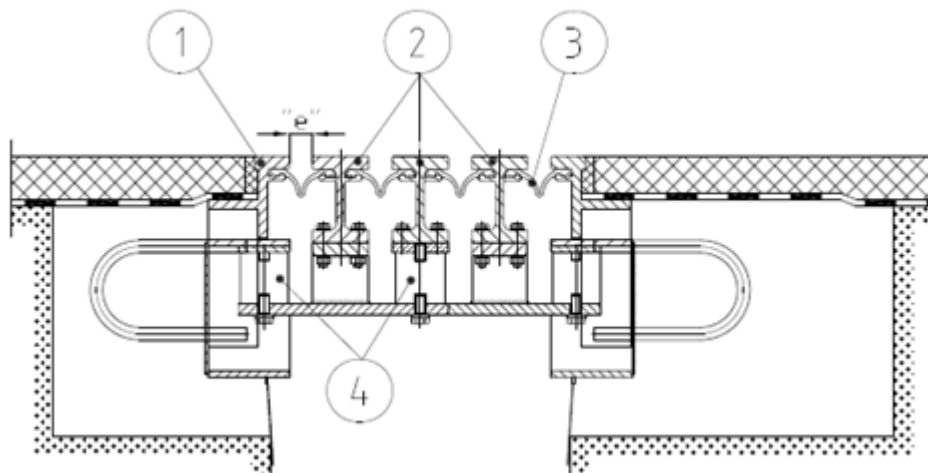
Cross section at carriageway between crossbeams of single crossbeam modular expansion joint with shear control elements under centre beams
